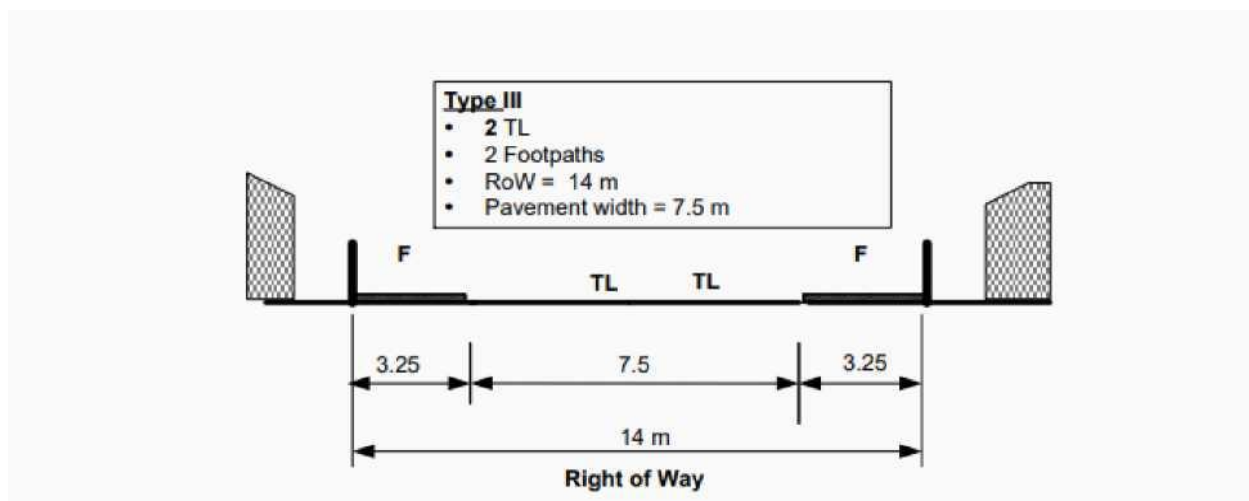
Typical Cross-section for Class A Roads (with RoW 14 m)
